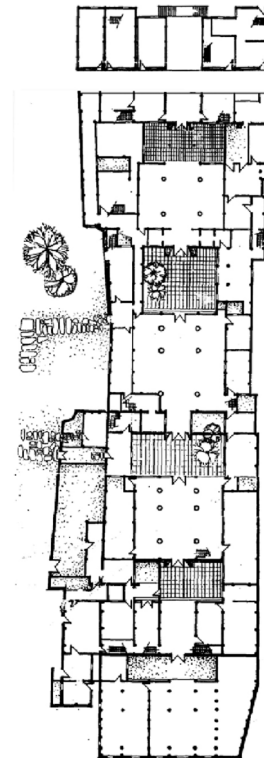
Typical plan of Suzhou waterfront dwelling
